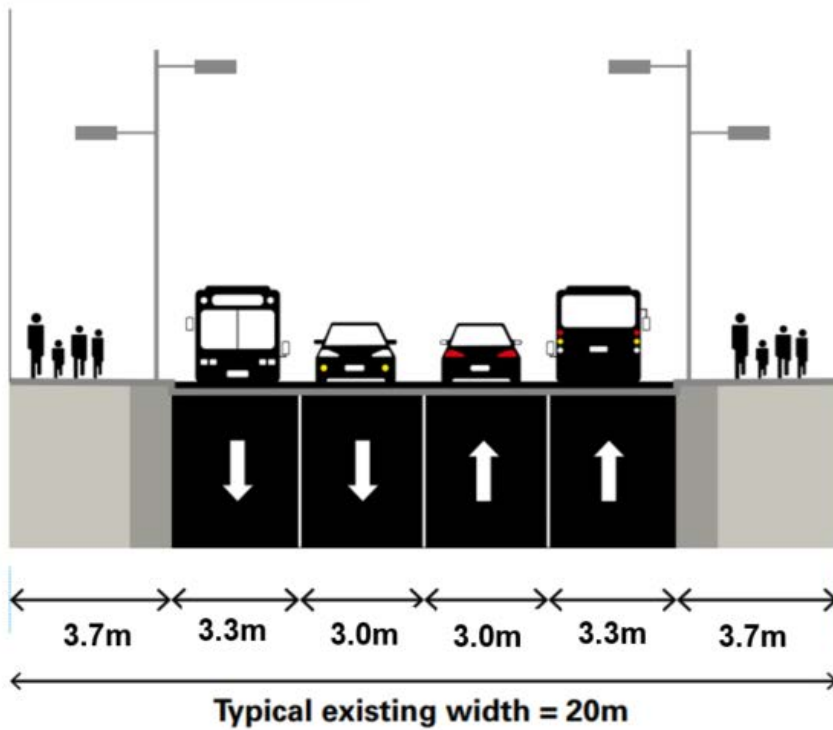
Typical Cross Section from Gerrard Street to Queen Street
